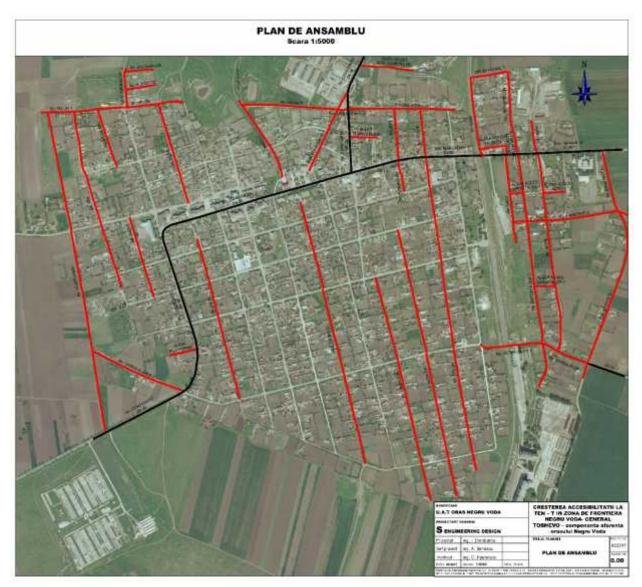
Modernized roads. Data source: Negru Vodă TownTown Hall.
